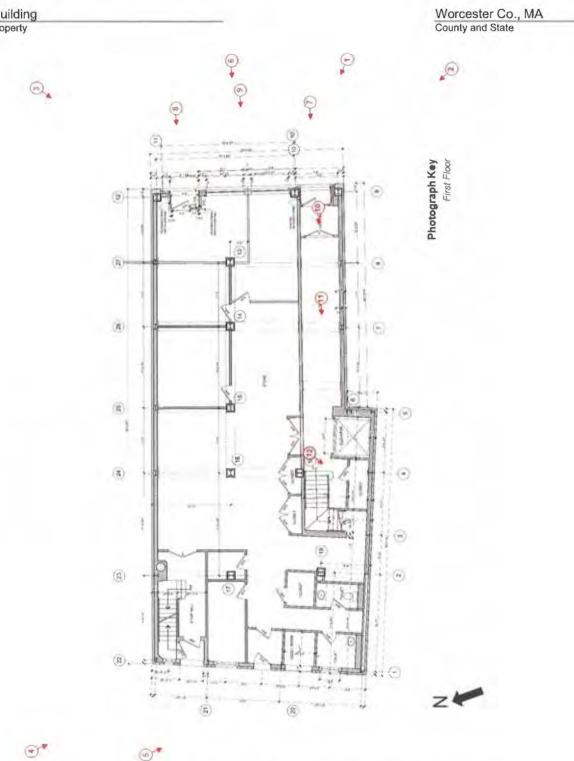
First-floor plan (2016), showing interior photo numbers and views. Reproduced by permission from the current owner, Wallachia LLC.
